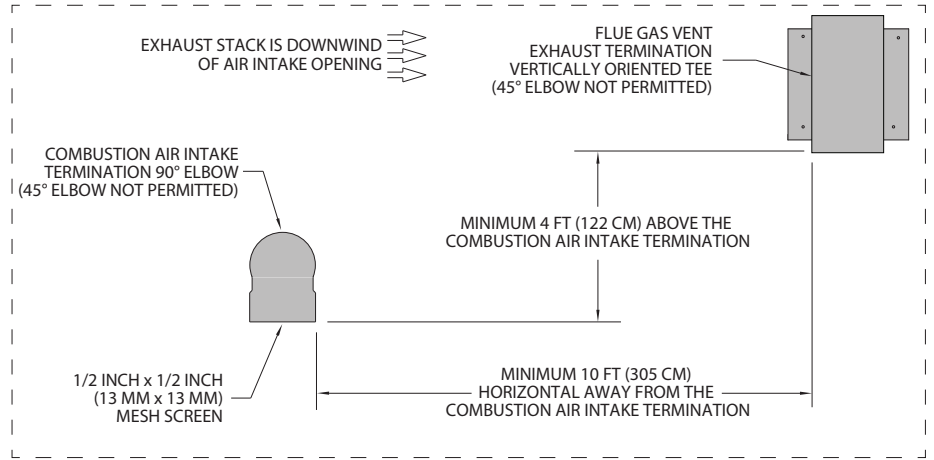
SIDEWALL PENETRATIONS DETAILS
